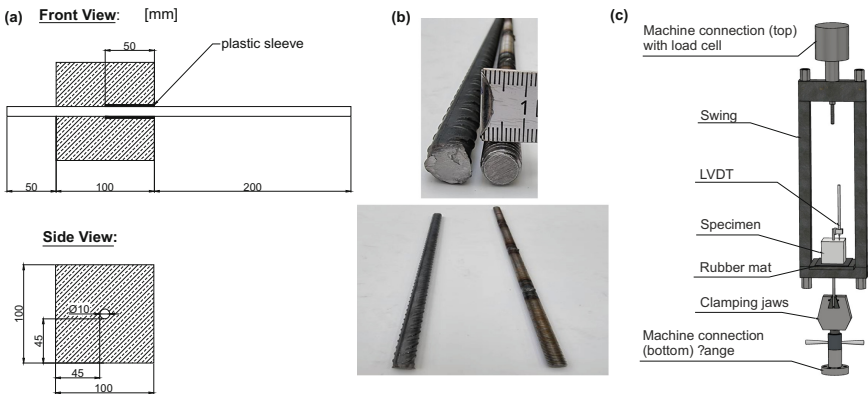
Pull-out test: (a) geometry of the specimen; (b) reinforcement types; and (c) testing setup.
